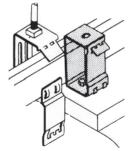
Illustration showing A854 with nut and bolt furnished to attach to fluorescent fixture. Use with A, B, C or D Series channel. Wt./C 34 lb.
